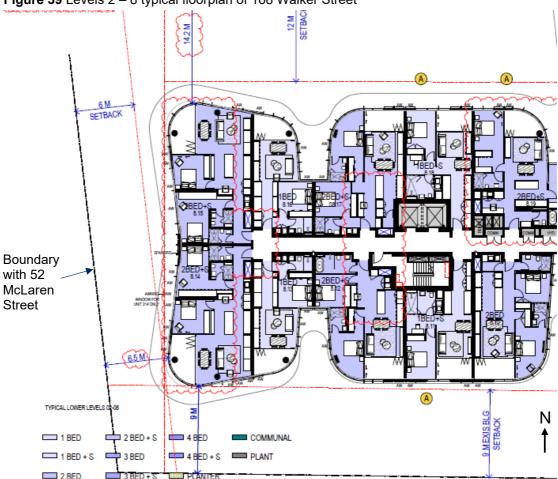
Levels 2 – 8 typical floorplan of 168 Walker Street
